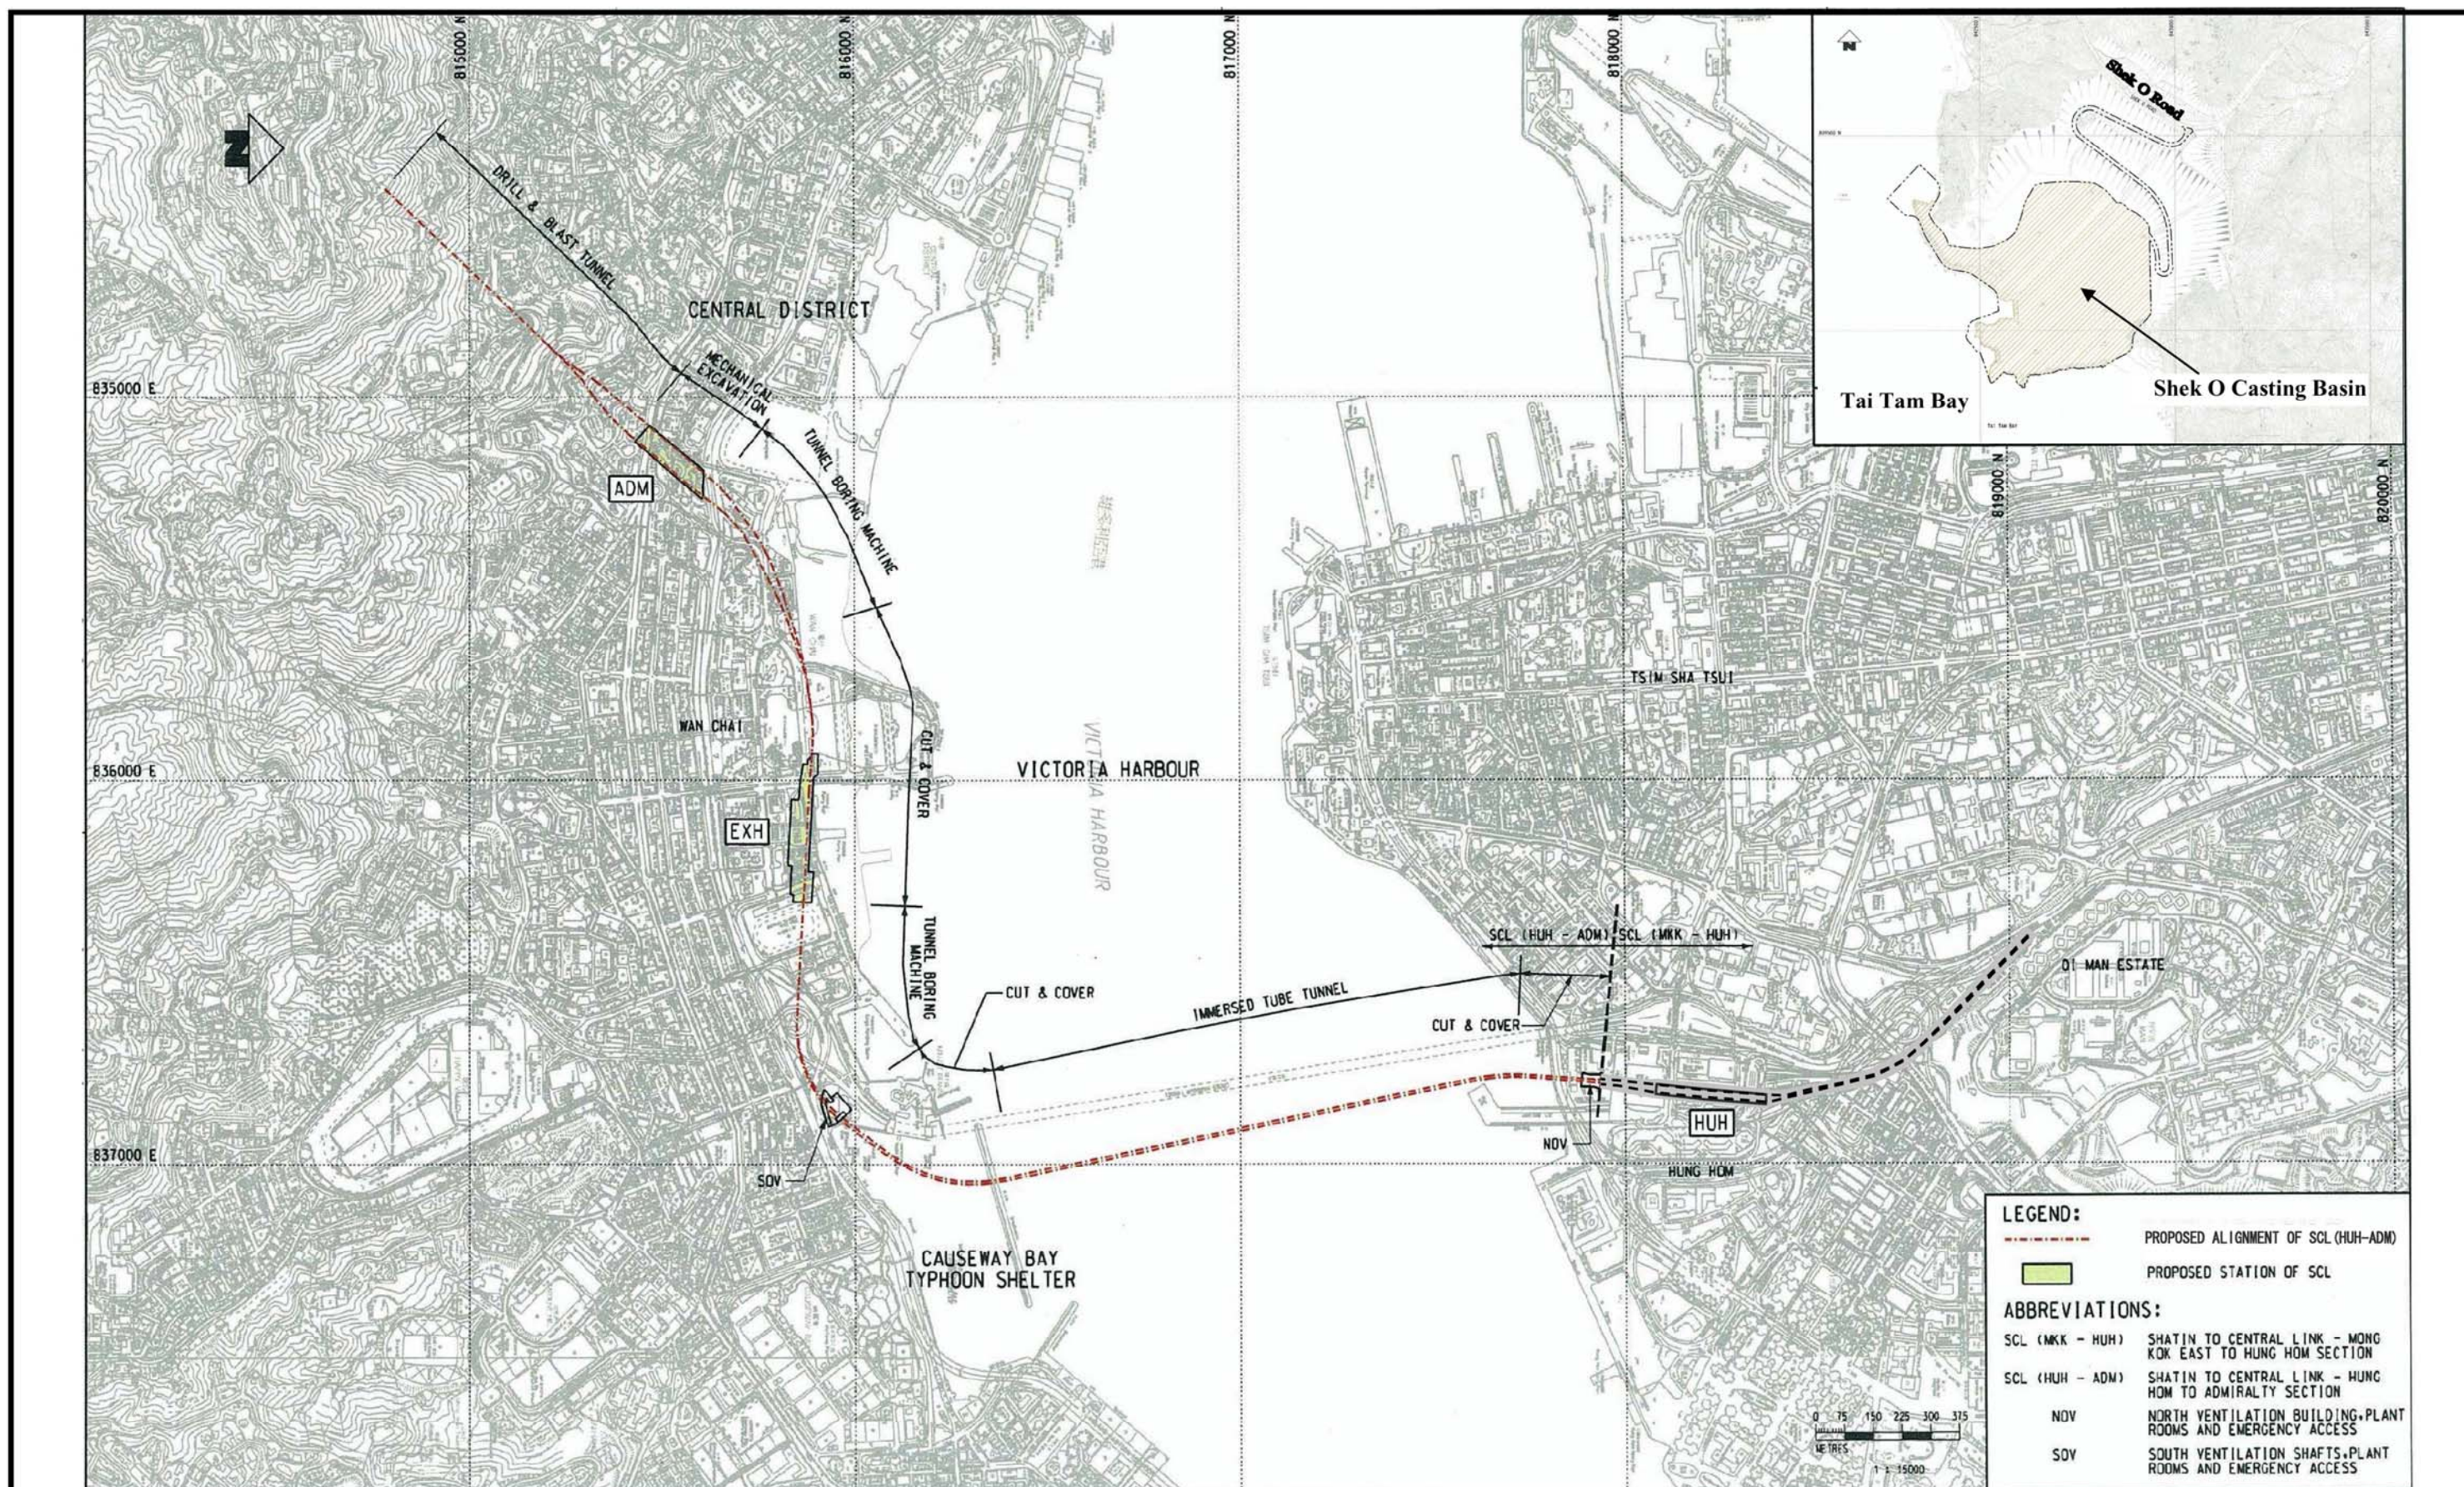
Shatin to Central Link - Hung Hom to Admiralty Section (SCL(HUH-ADM)) General Layout Plan
